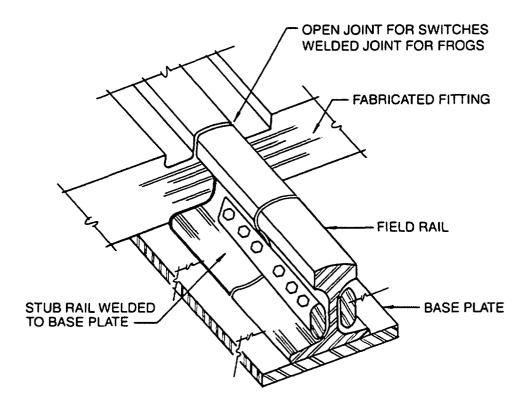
Fabricated Fitting with Bolted Stub Rail.
